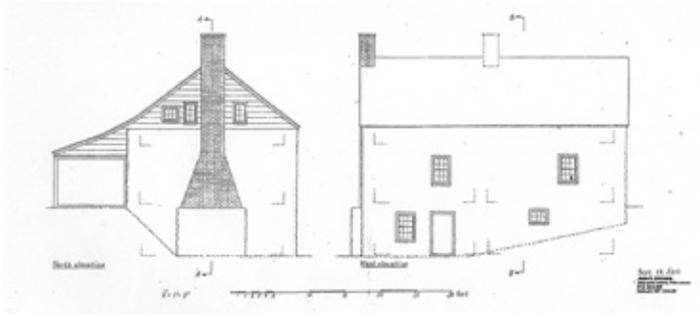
Existing conditions, north & west elevations. Drawings by John Stevens, 2019.
